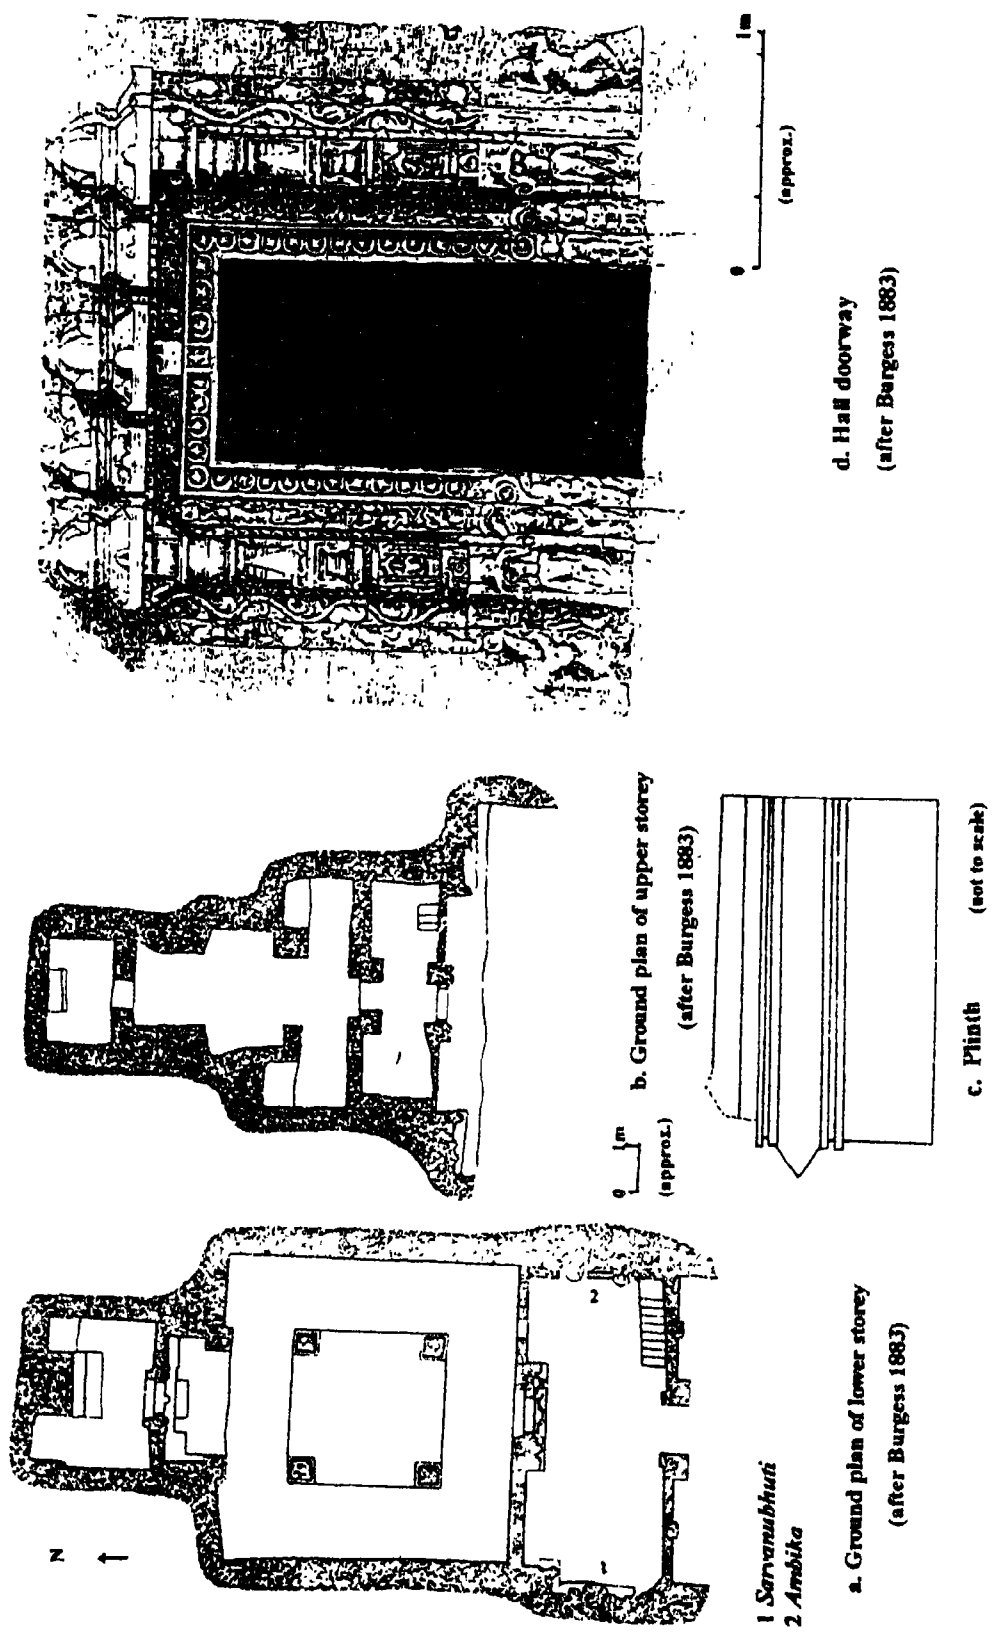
Ground plan, hall doorway & plinth of Cave II at Ankai-Tankai
